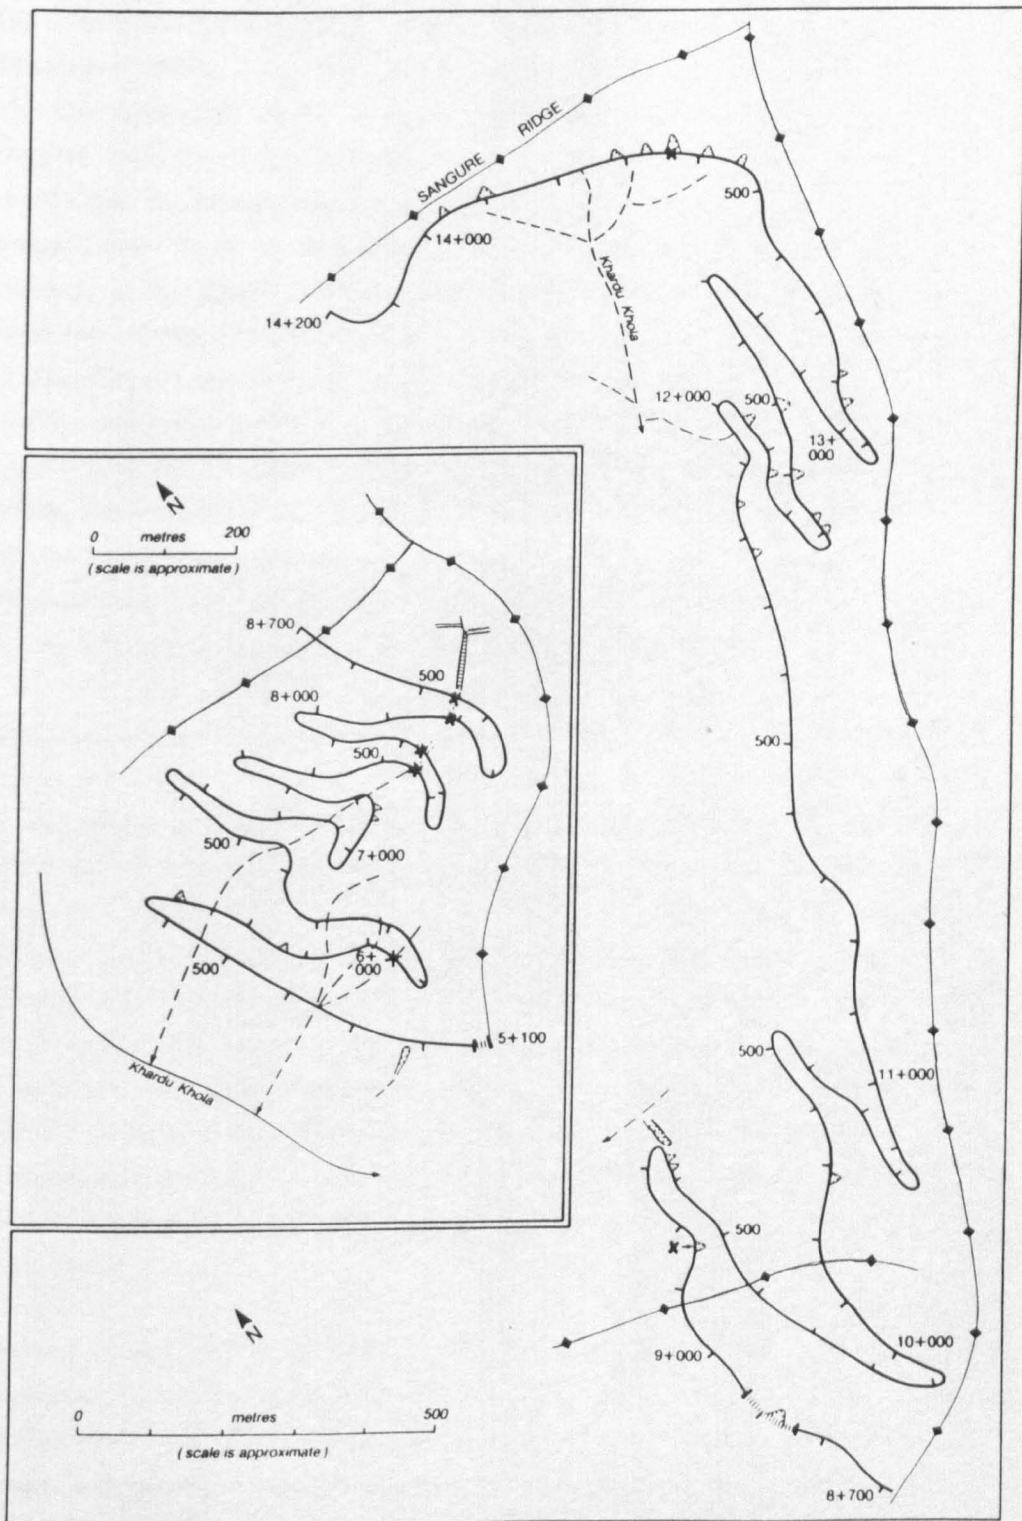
Instability Occurring Along the Dharan-Dhankuta Road in September 1984 (Km 5.100-14.200). (For Legend see A.1)
